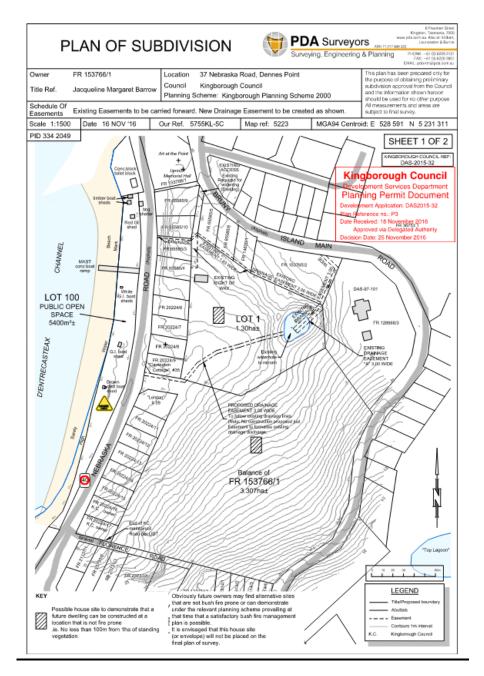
Approved Plan of Subdivision - DAS 2-15-32
